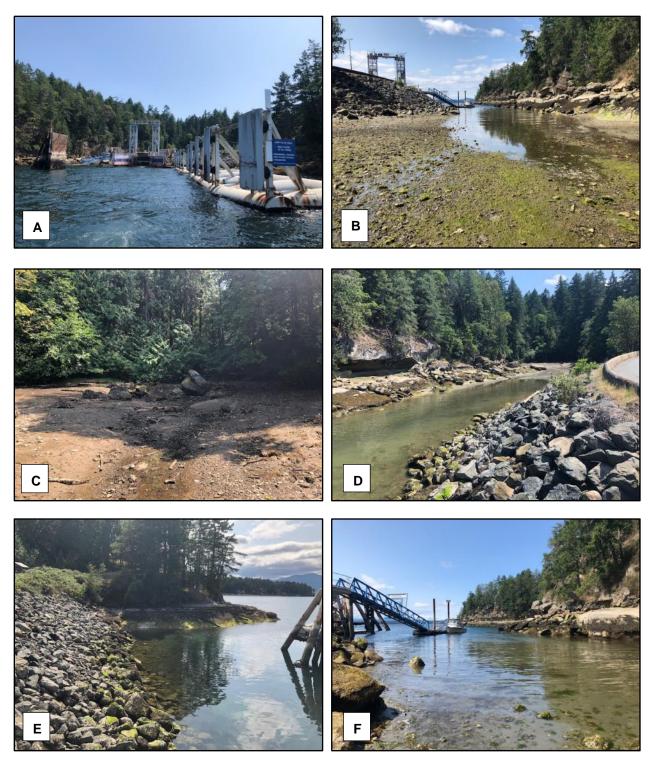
The Project Site looking (A) east at existing berth infrastructure, B) west from the inlet towards the berth, C) east (upstream) where unnamed tributary enters the inlet, D) east from berth towards inlet, E) south from the berth along riprap, and F) west from the inlet towards the emergency services dock.
